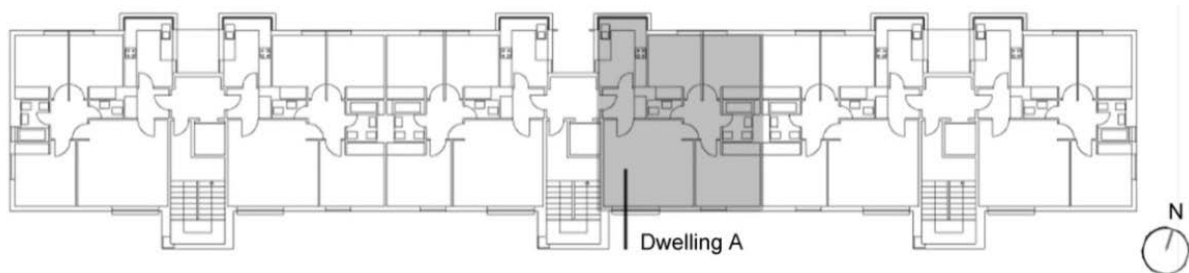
Housing block considered for this study. Floor plan of 6 storey building located in Madrid
